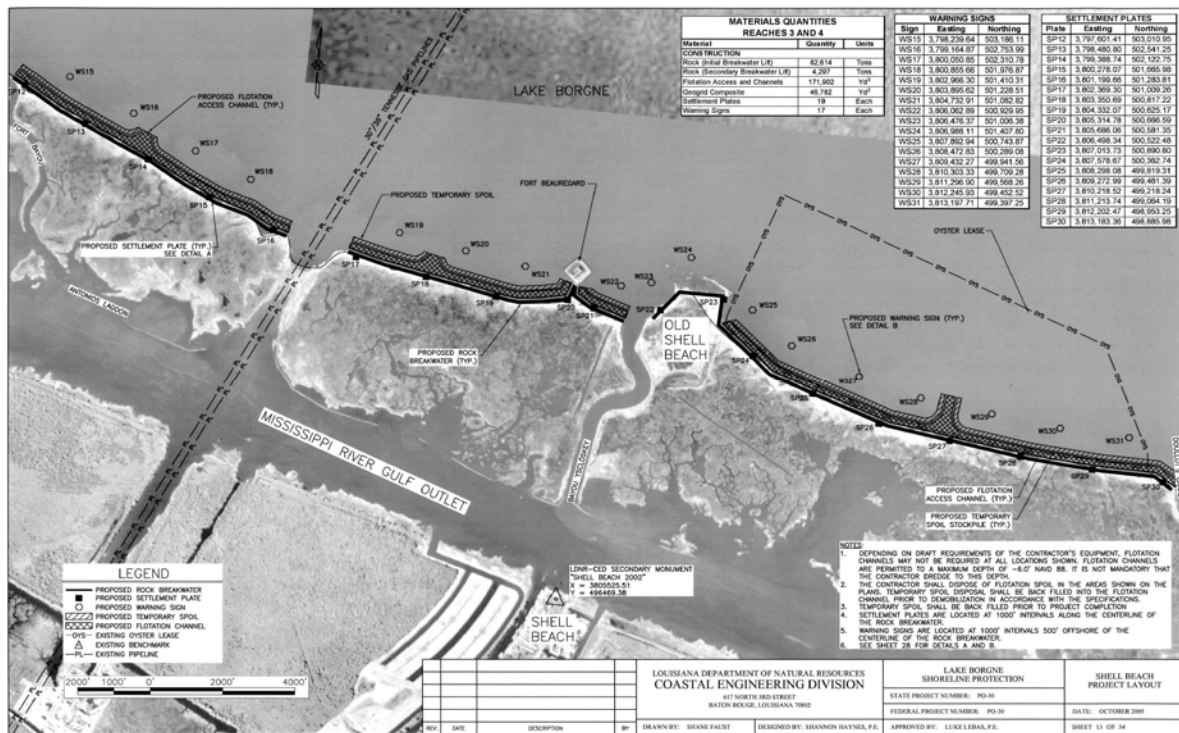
Shell Beach Project Layout and Breakwater Alignment
